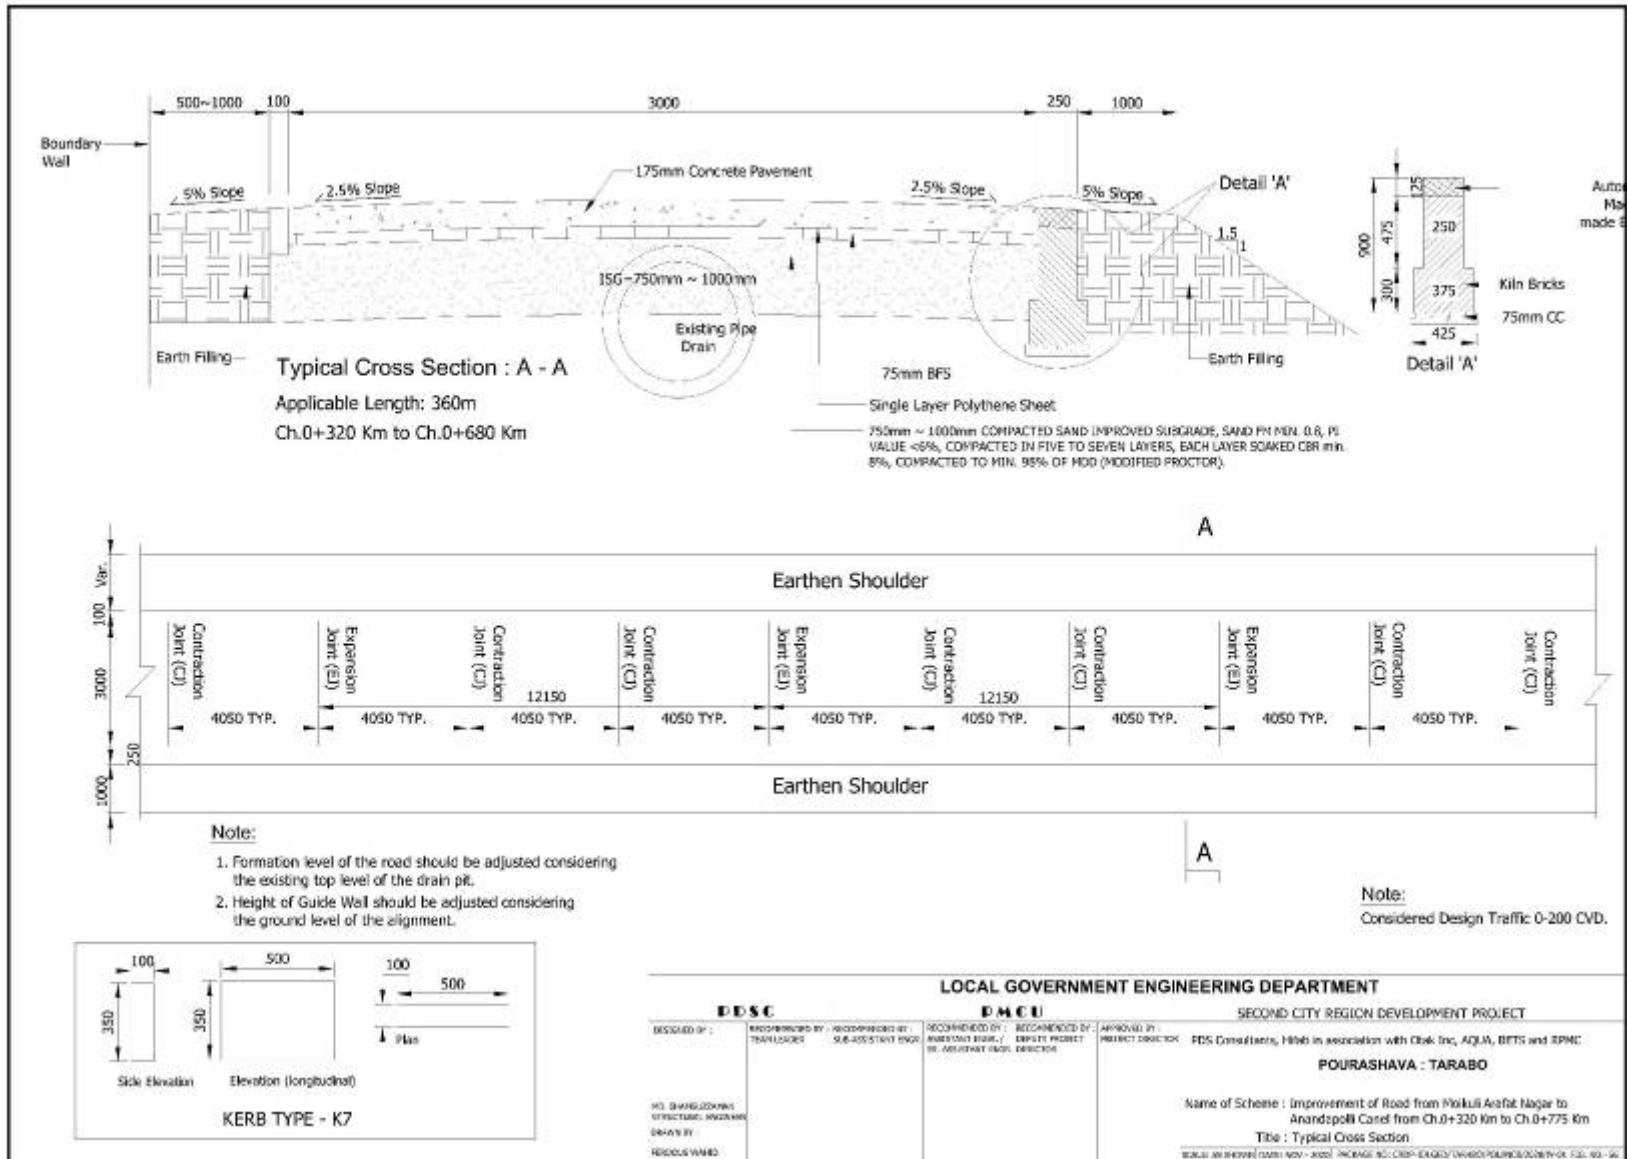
Cross section of road from Moikuli Arafat Nagar to Anandapalli Canal (Ch. 320 - 775m)
